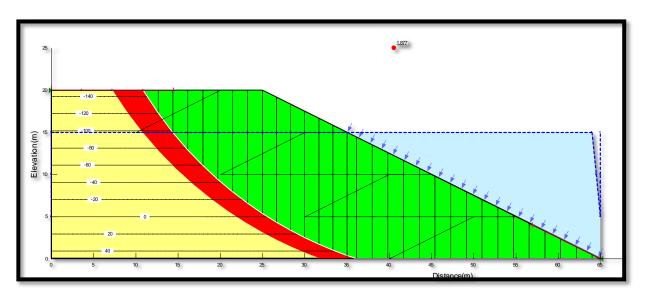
Embankment cross section for 1:2 slope at 15 m water level
